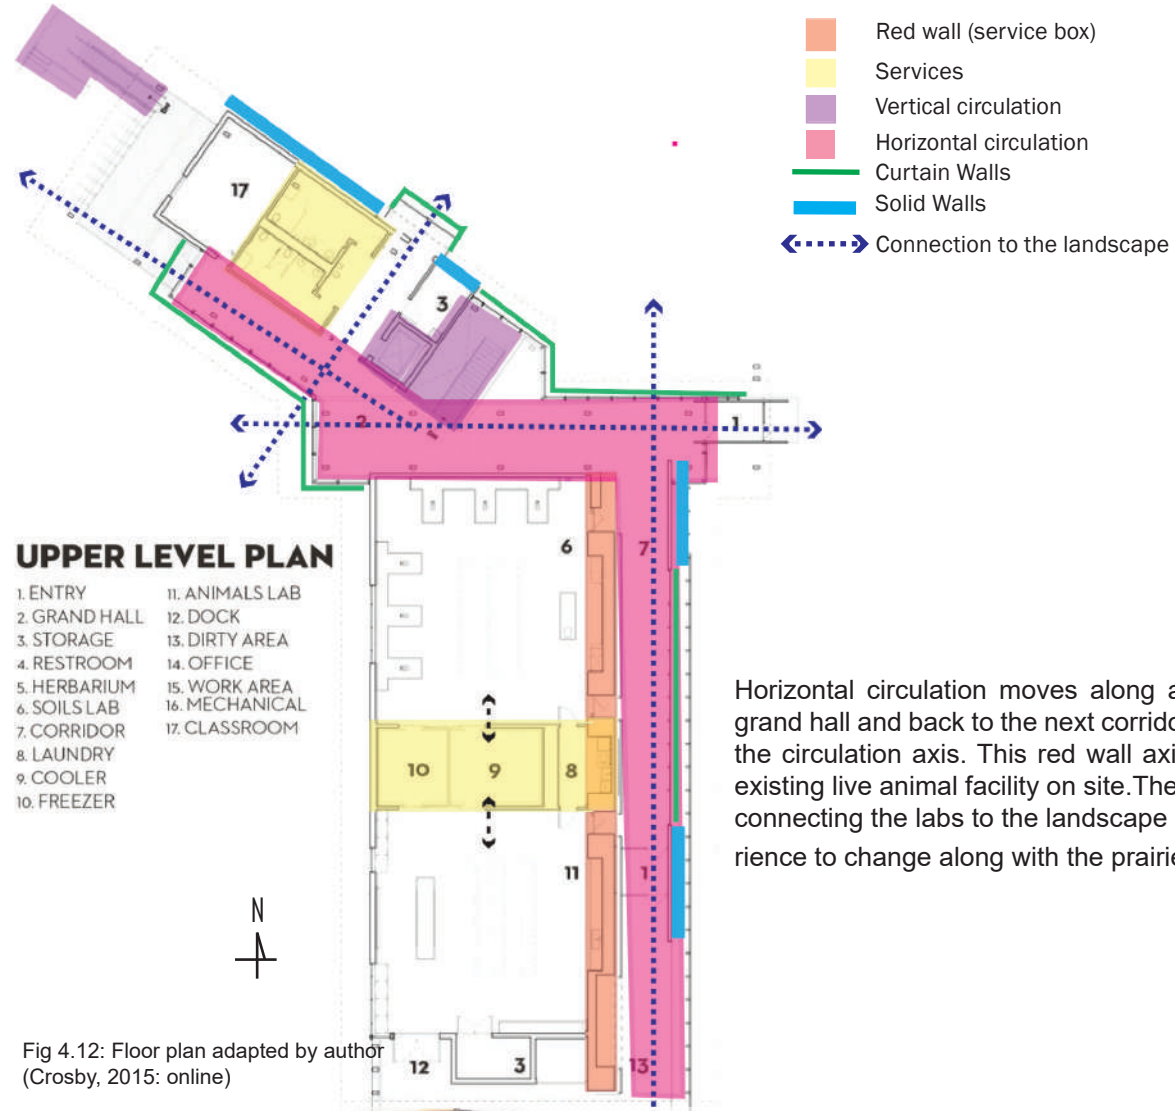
Floor plan adapted by author (Crosby, 2015: online)
